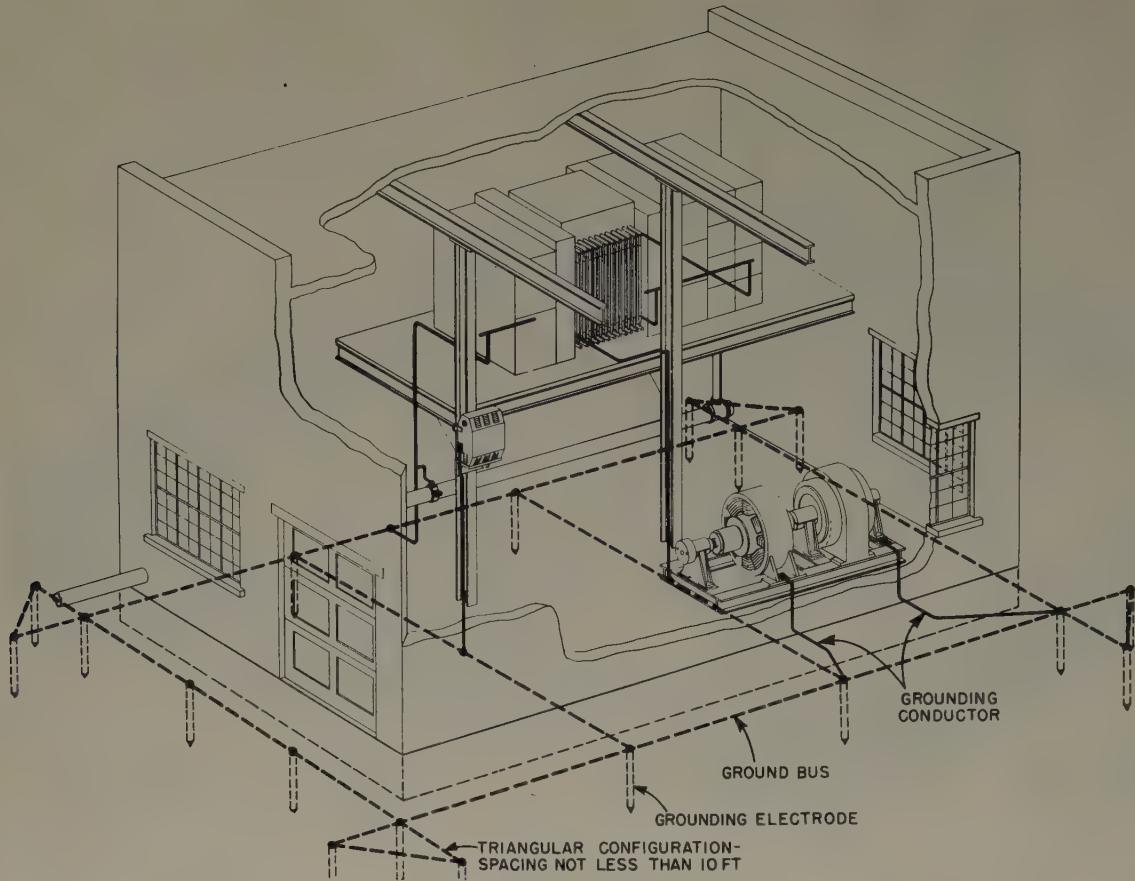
Typical grounding system for a building and heavy electric apparatus in the building
